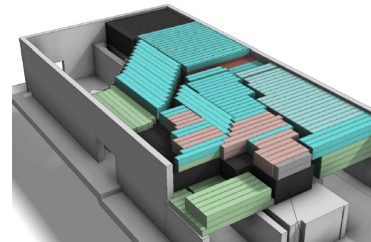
The shielding within the existing *Transfer Halle* (TR) will be improved by about 280 new shielding bars made of normal and heavy haematite concrete. The total shielding mass in this area will increase from 5400 t to 8050 t. The bars will be installed in 2022 but the upgrade of the existing building to support the additional load is part of the GAF project.
